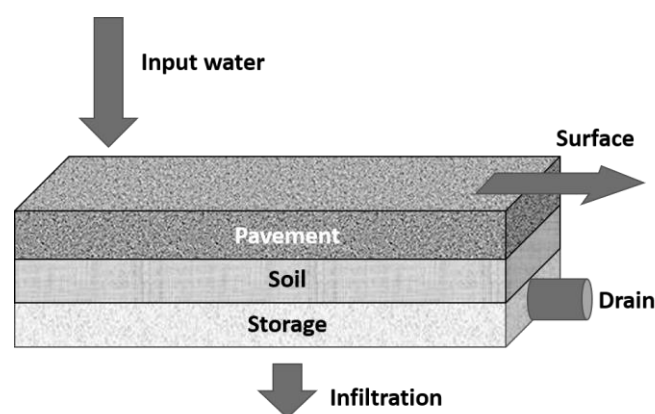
Porous pavement conveys rainfall water on the surface as flooding volume, drains it to network or permeable areas, or infiltrates it below where possible.
